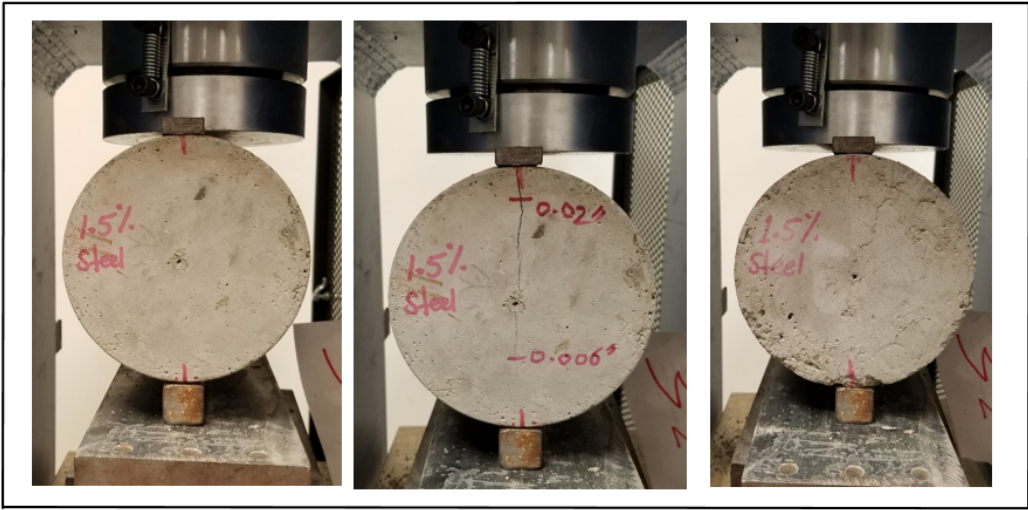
22. Cylinder Tensile Failure SFRC1.5%
